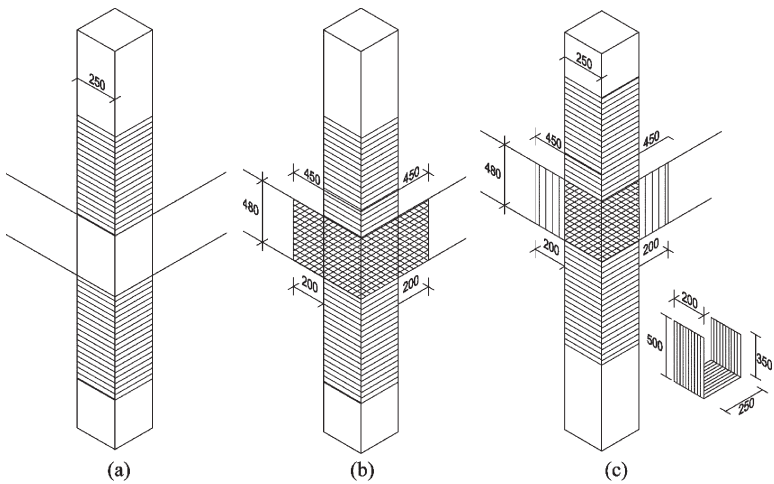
Rehabilitation of exterior columns and joints: column wrapping (a), joint strengthening (b), U-wrapping of joint strengthening on the beams (c)
